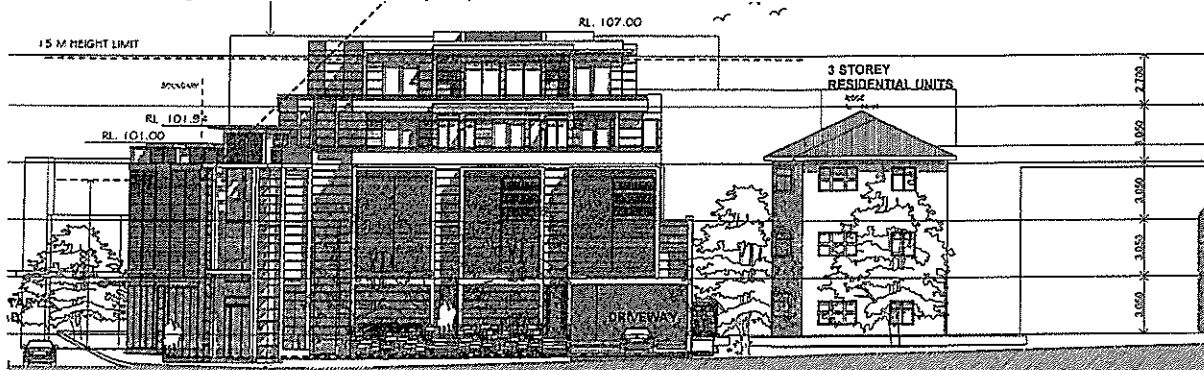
An elevation of the proposal fronting Cowles Road. Note the relationship with the existing residential flat building to the rear.
